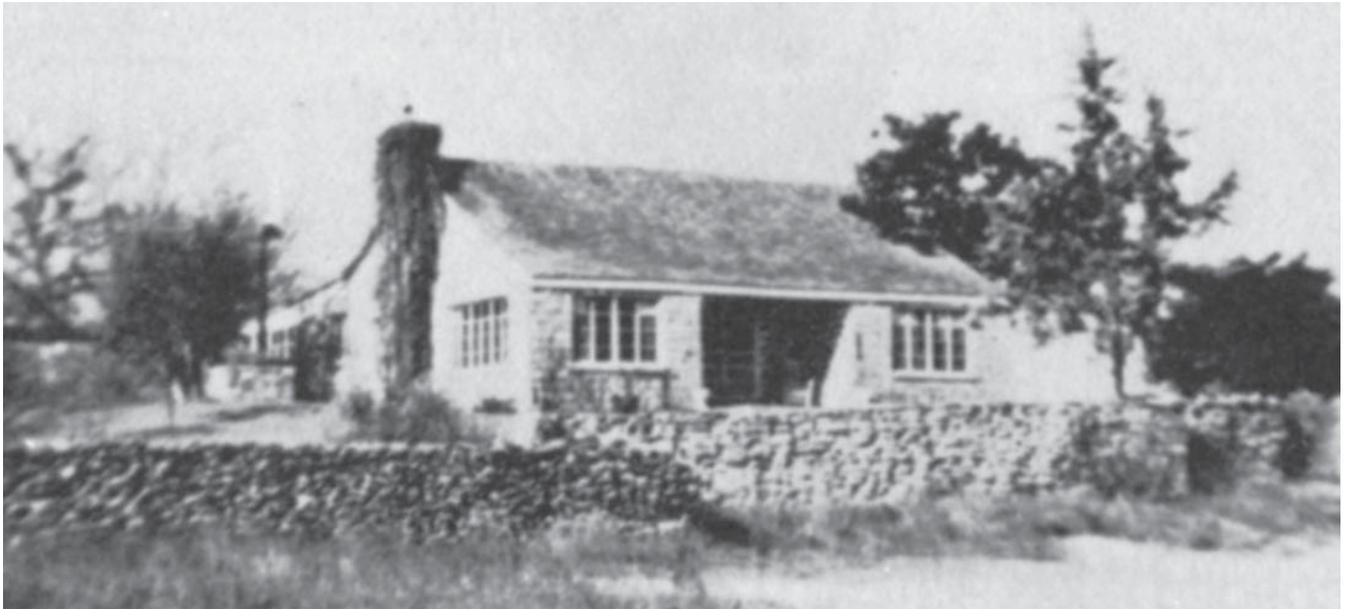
1930s Renovations: enlarged window openings, casement windows and west back addition
